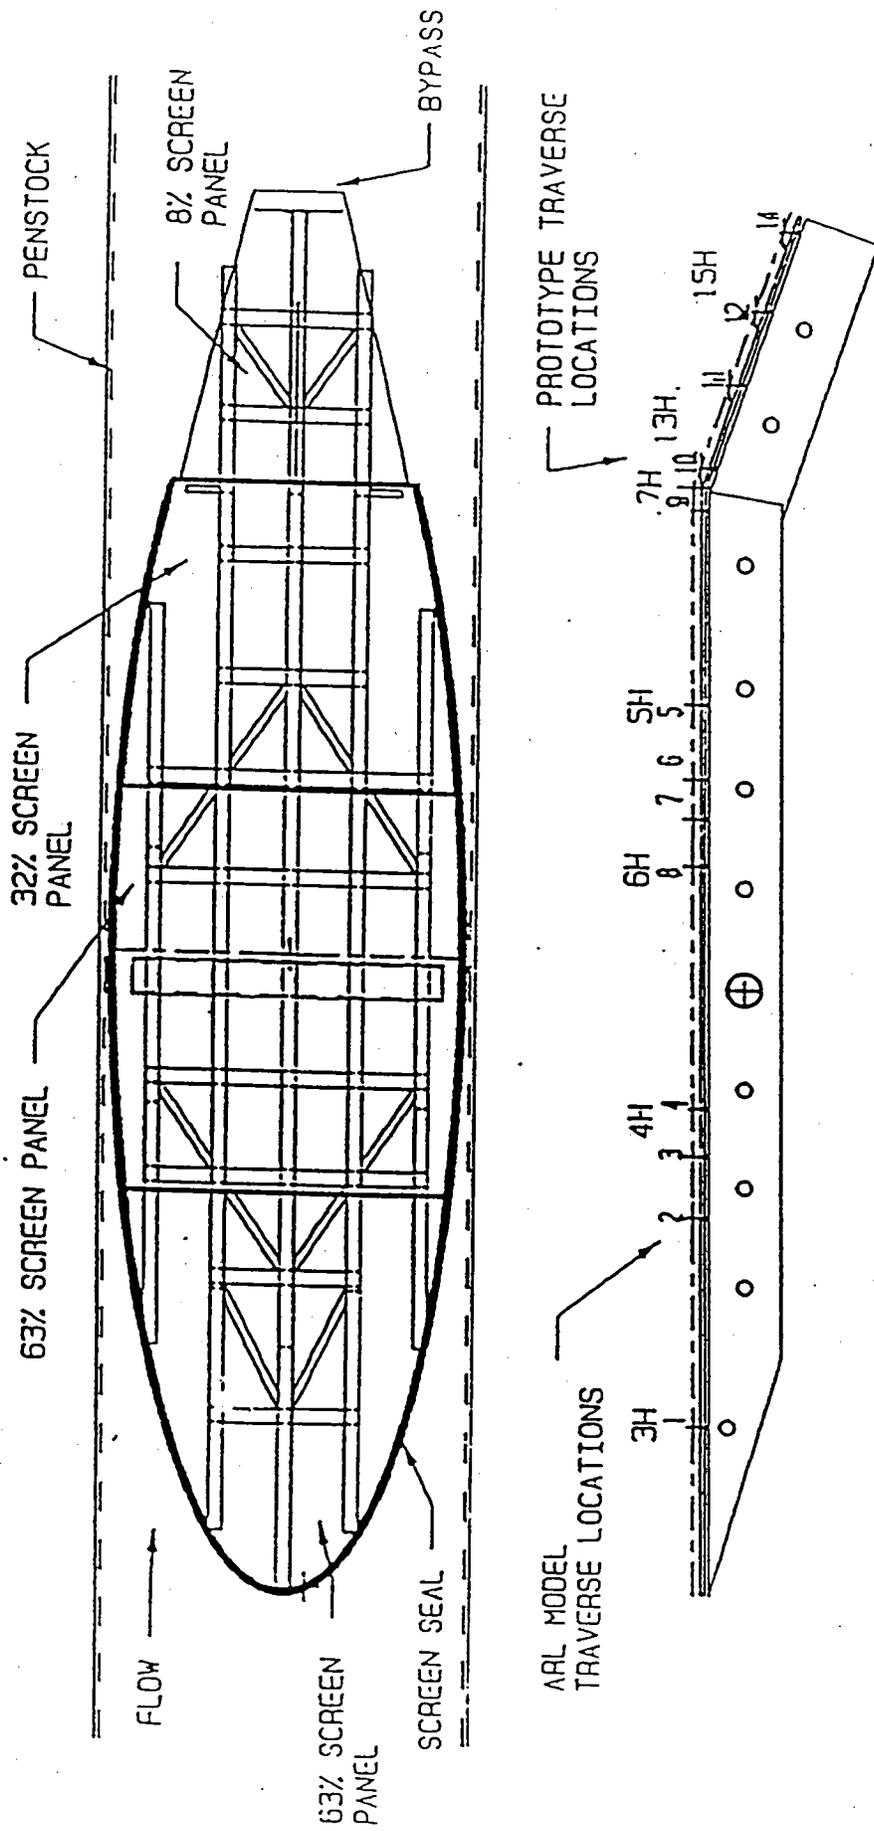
Plan and Section Views of typical Eicher Screen Structure.
